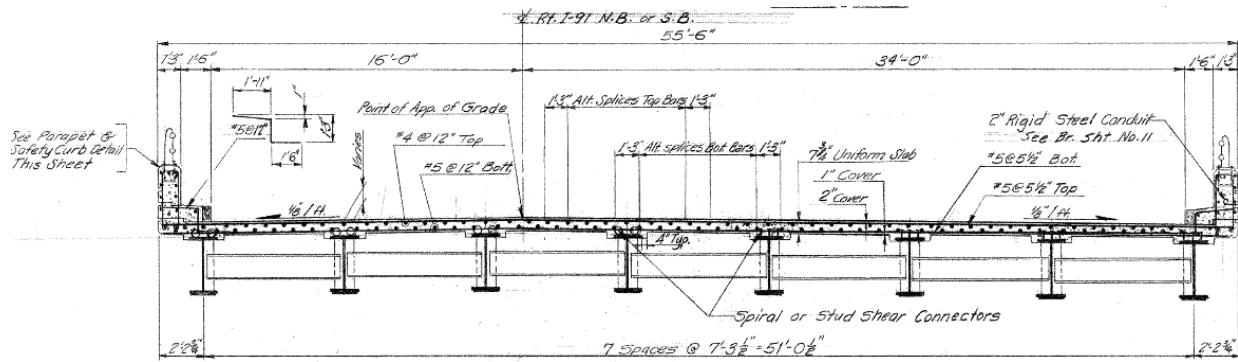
Cross section of the Meriden Bridge in the drawing
